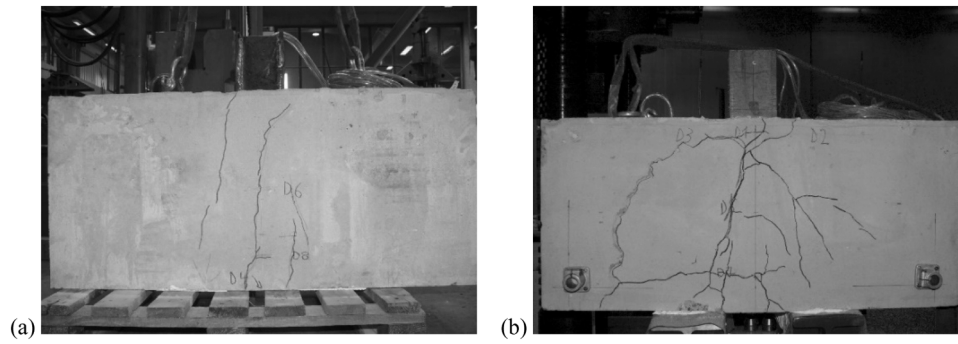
Cracks obtained on the wall face at failure in (a) Specimen A and (b) Specimen C.
